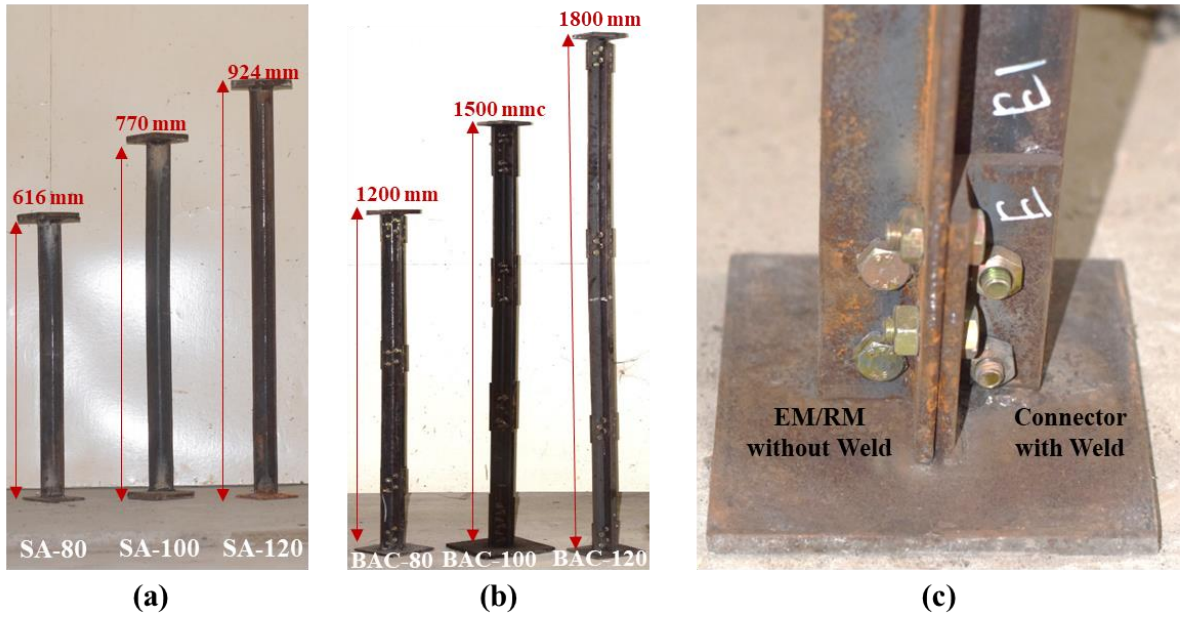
Details of Experimental Specimens; (a) Single Angle specimens; (b) Bi-Angled Cruciform specimens; (c) Bottom Connector Details
